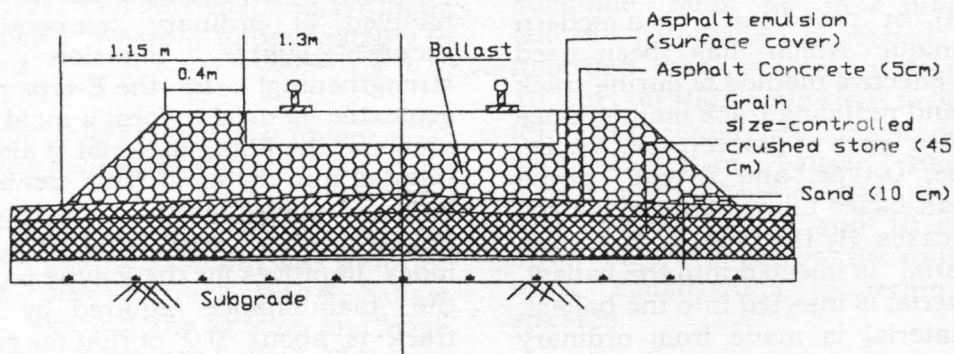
Construction elements of a ballasted track laid on reinforced subgrade.
